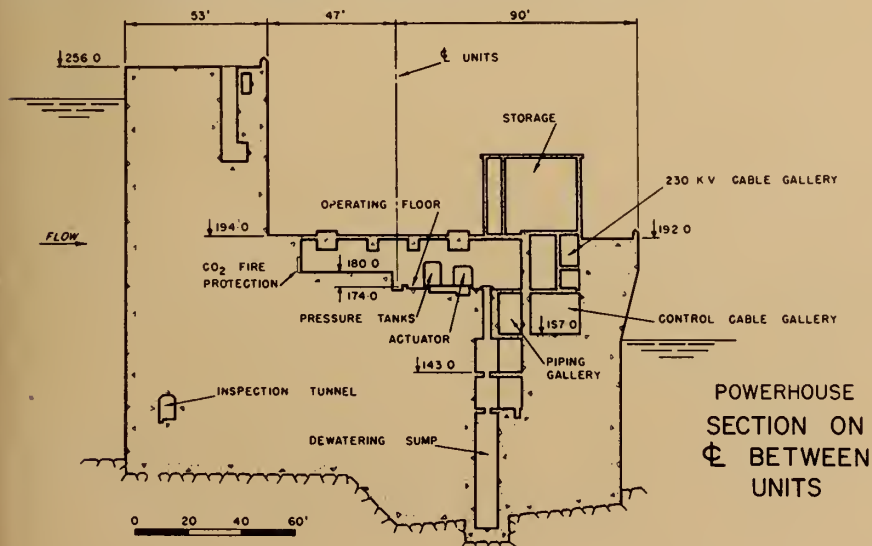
Canadian powerhouse, typical cross-section through a unit.
